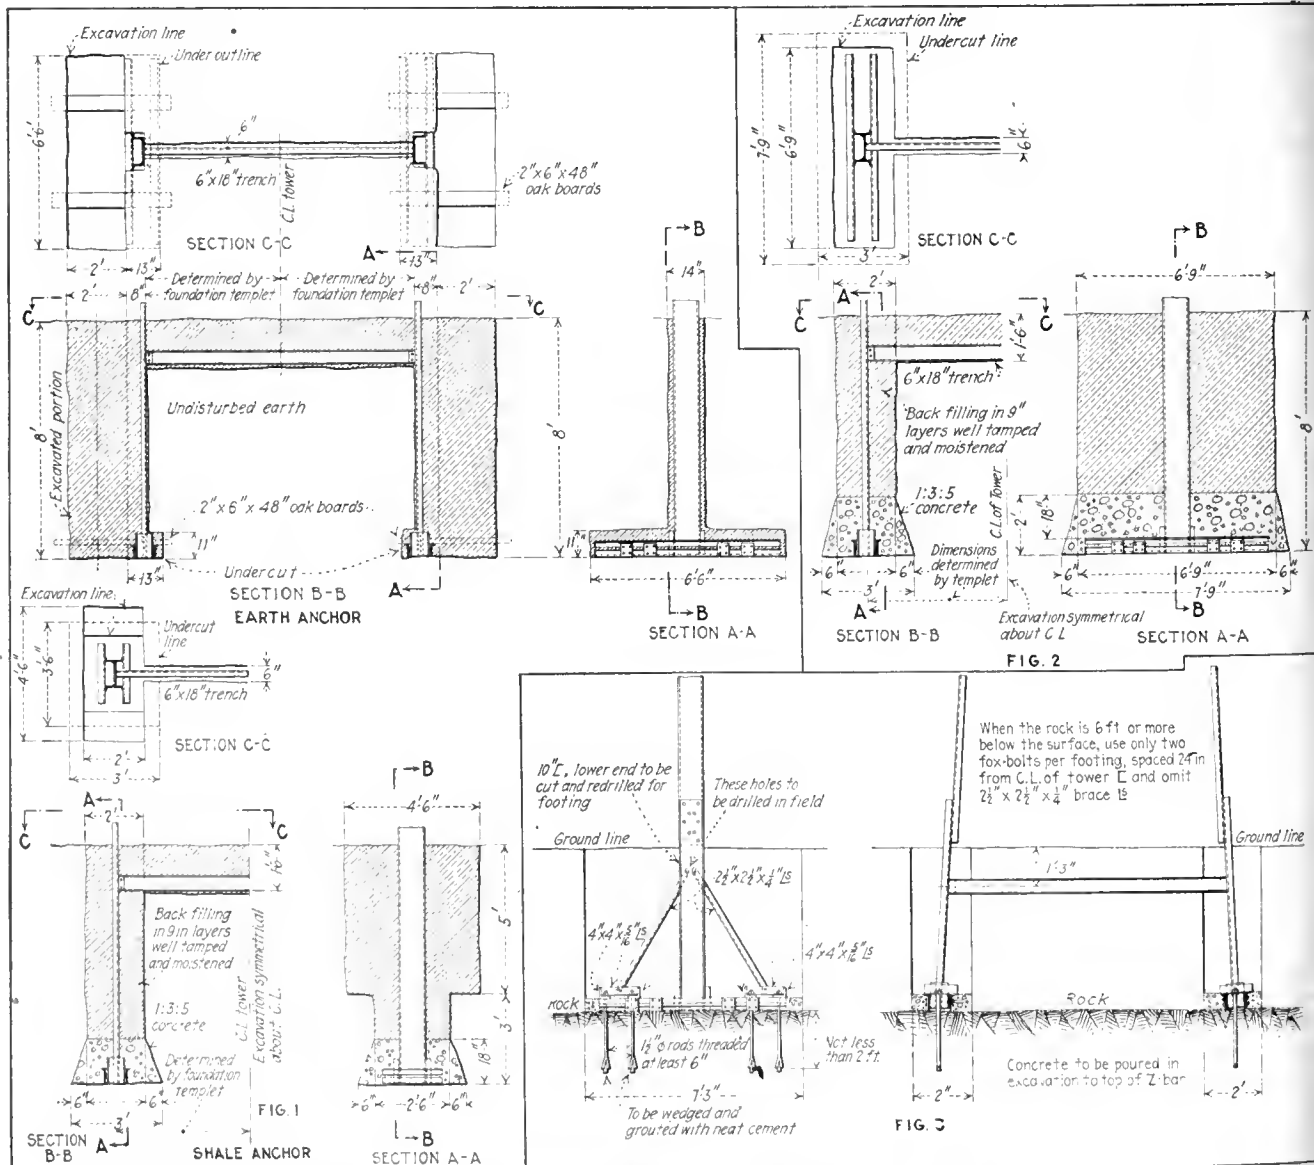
EARTH AND SHALE ANCHOR FOR FLEXIBLE TOWERS. FIG. 2—FOOTINGS FOR FLEXIBLE A FRAMES IN WET GROUND. FIG. 3—ROCK FOOTINGS FOR FLEXIBLE TOWERS
